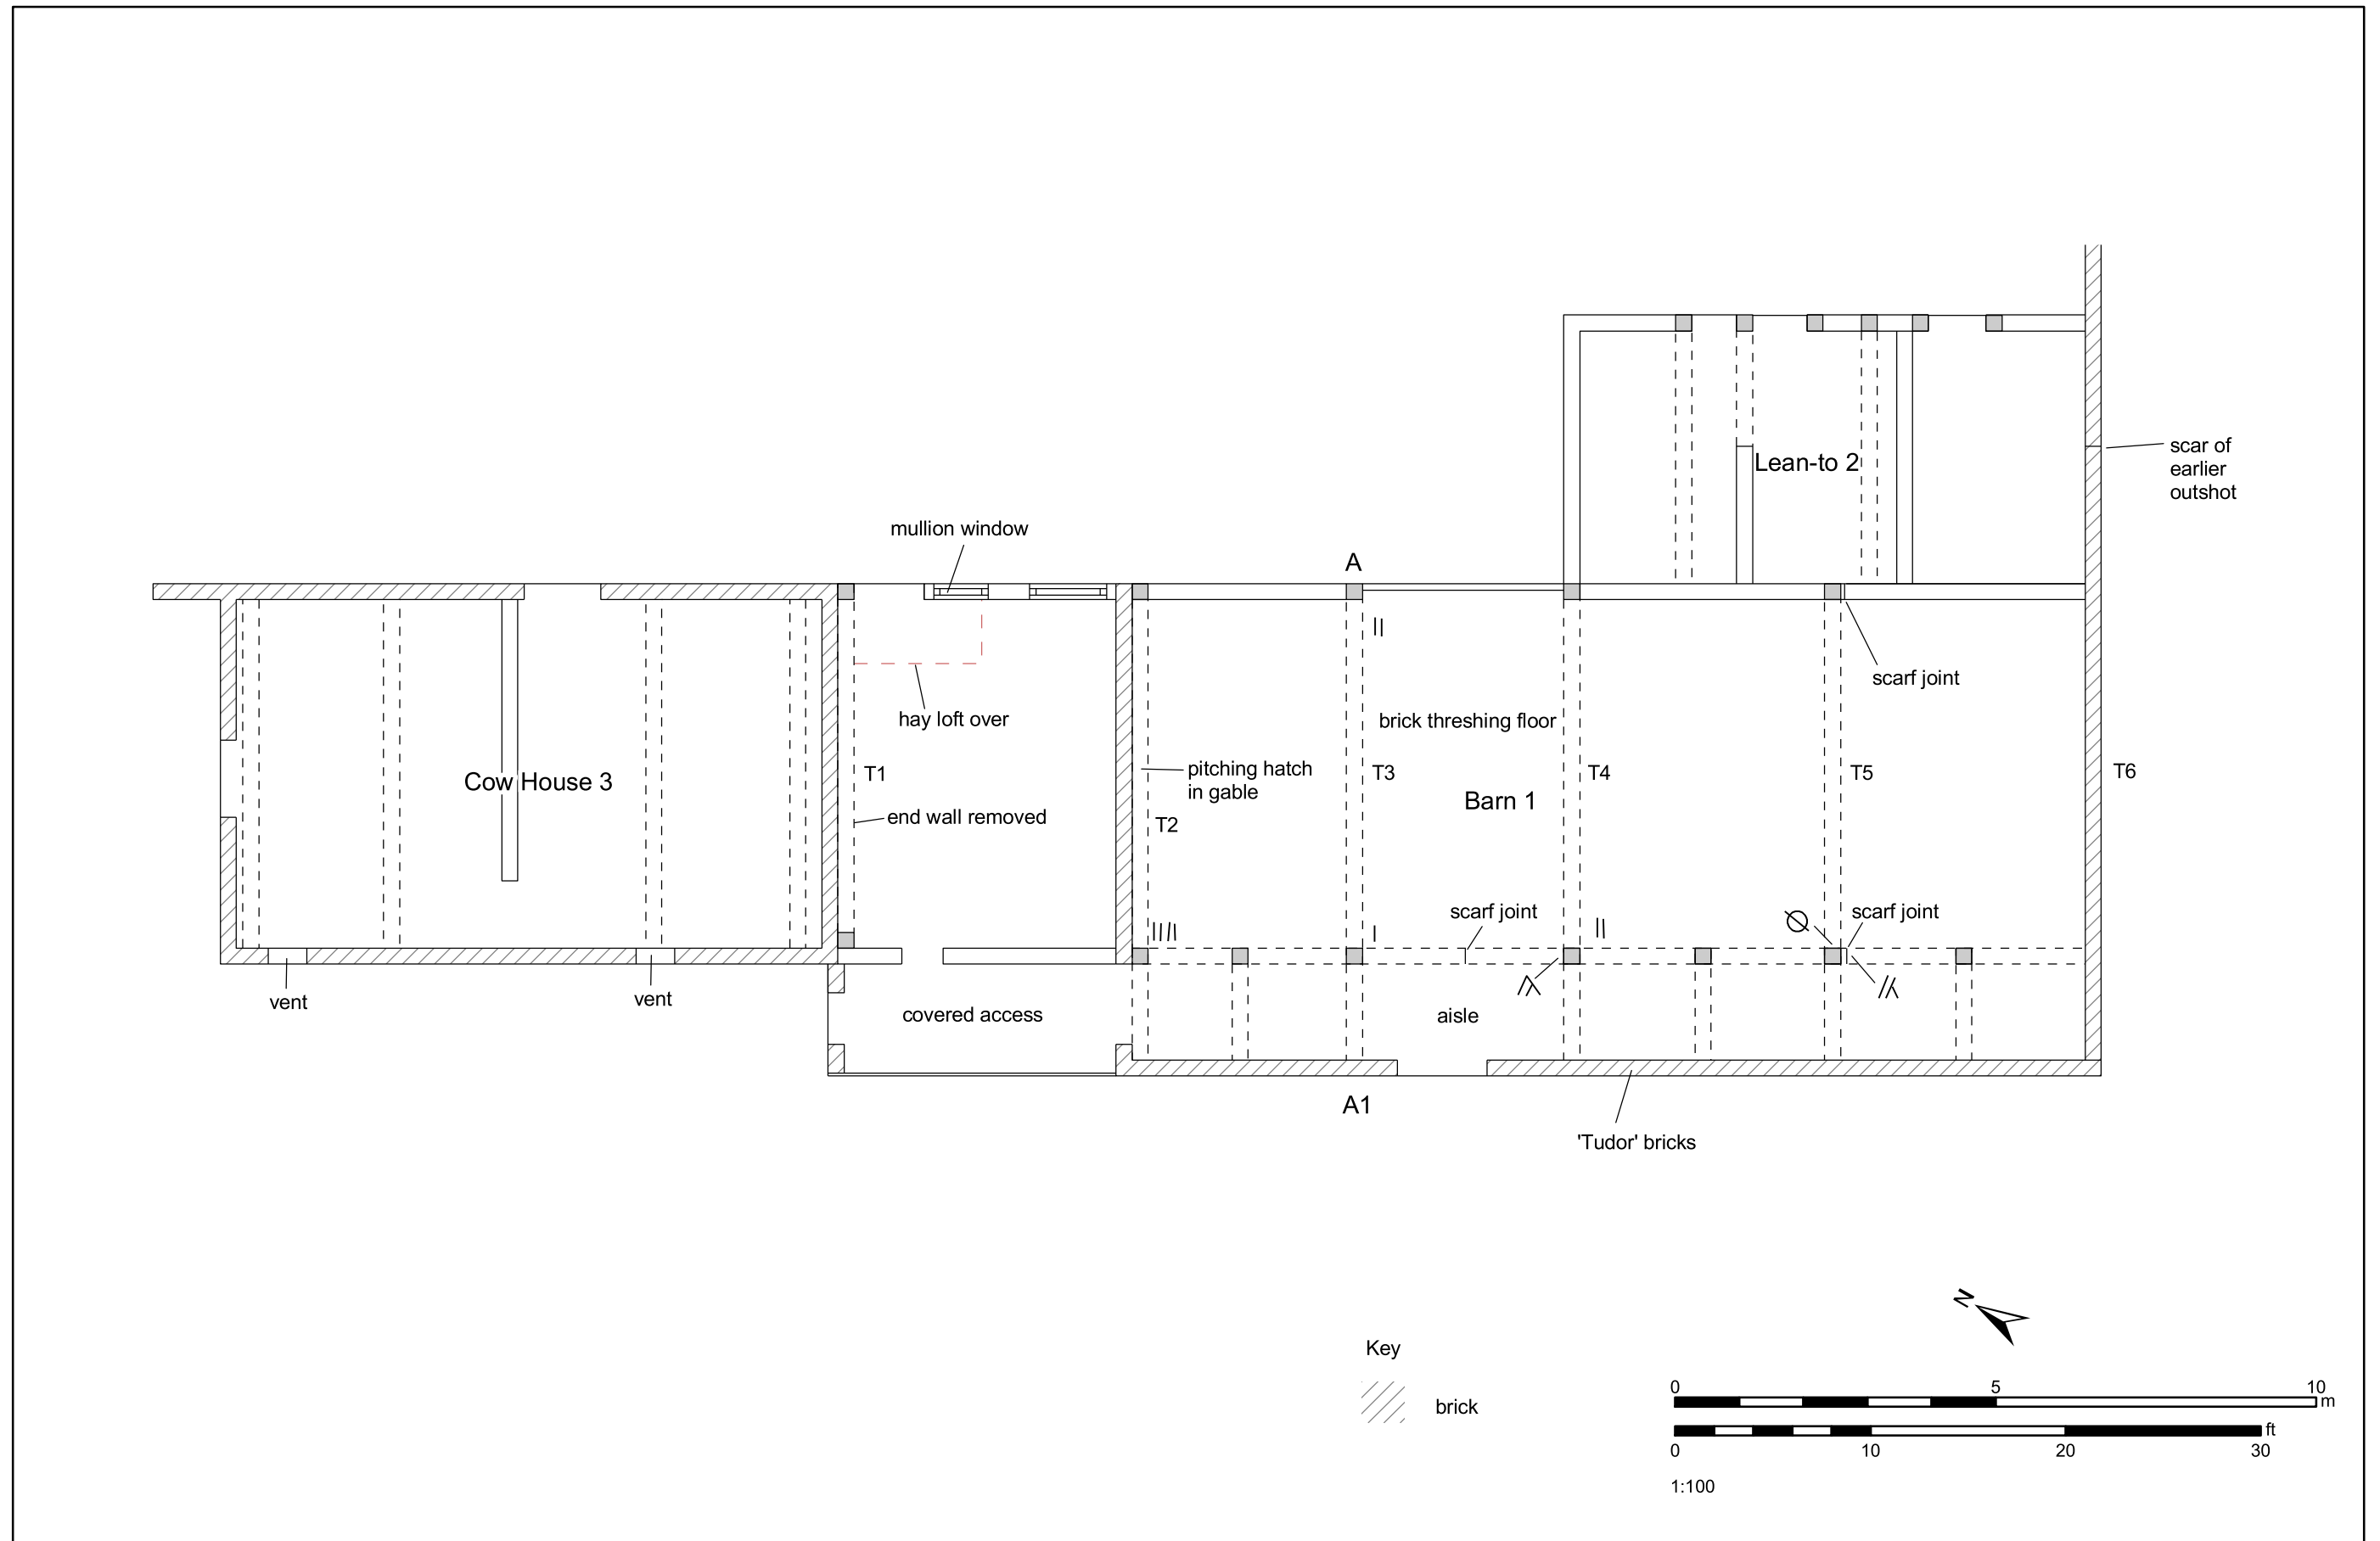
Plans of farm structures to be converted : buildings 1-3
